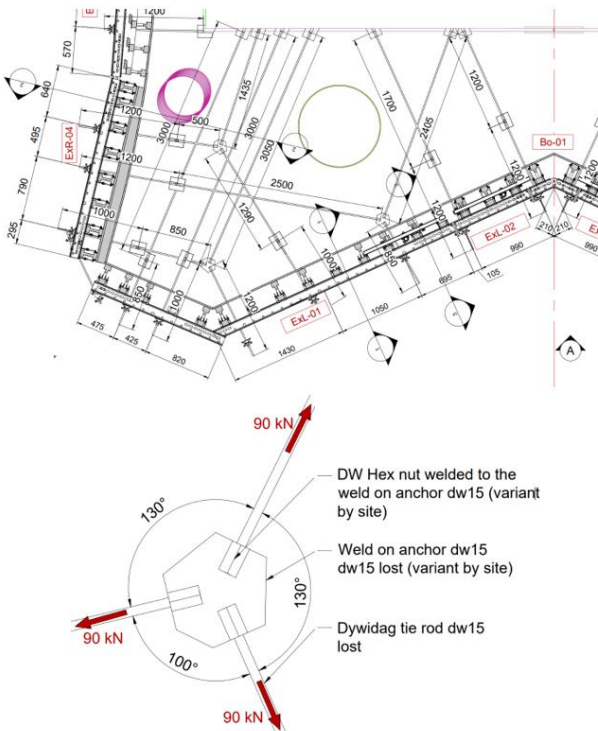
Partial view of VARIO formwork layout and detail of special DW15 connector – original PERI solution - that allows declashing of formwork ties with pylon embedded parts
